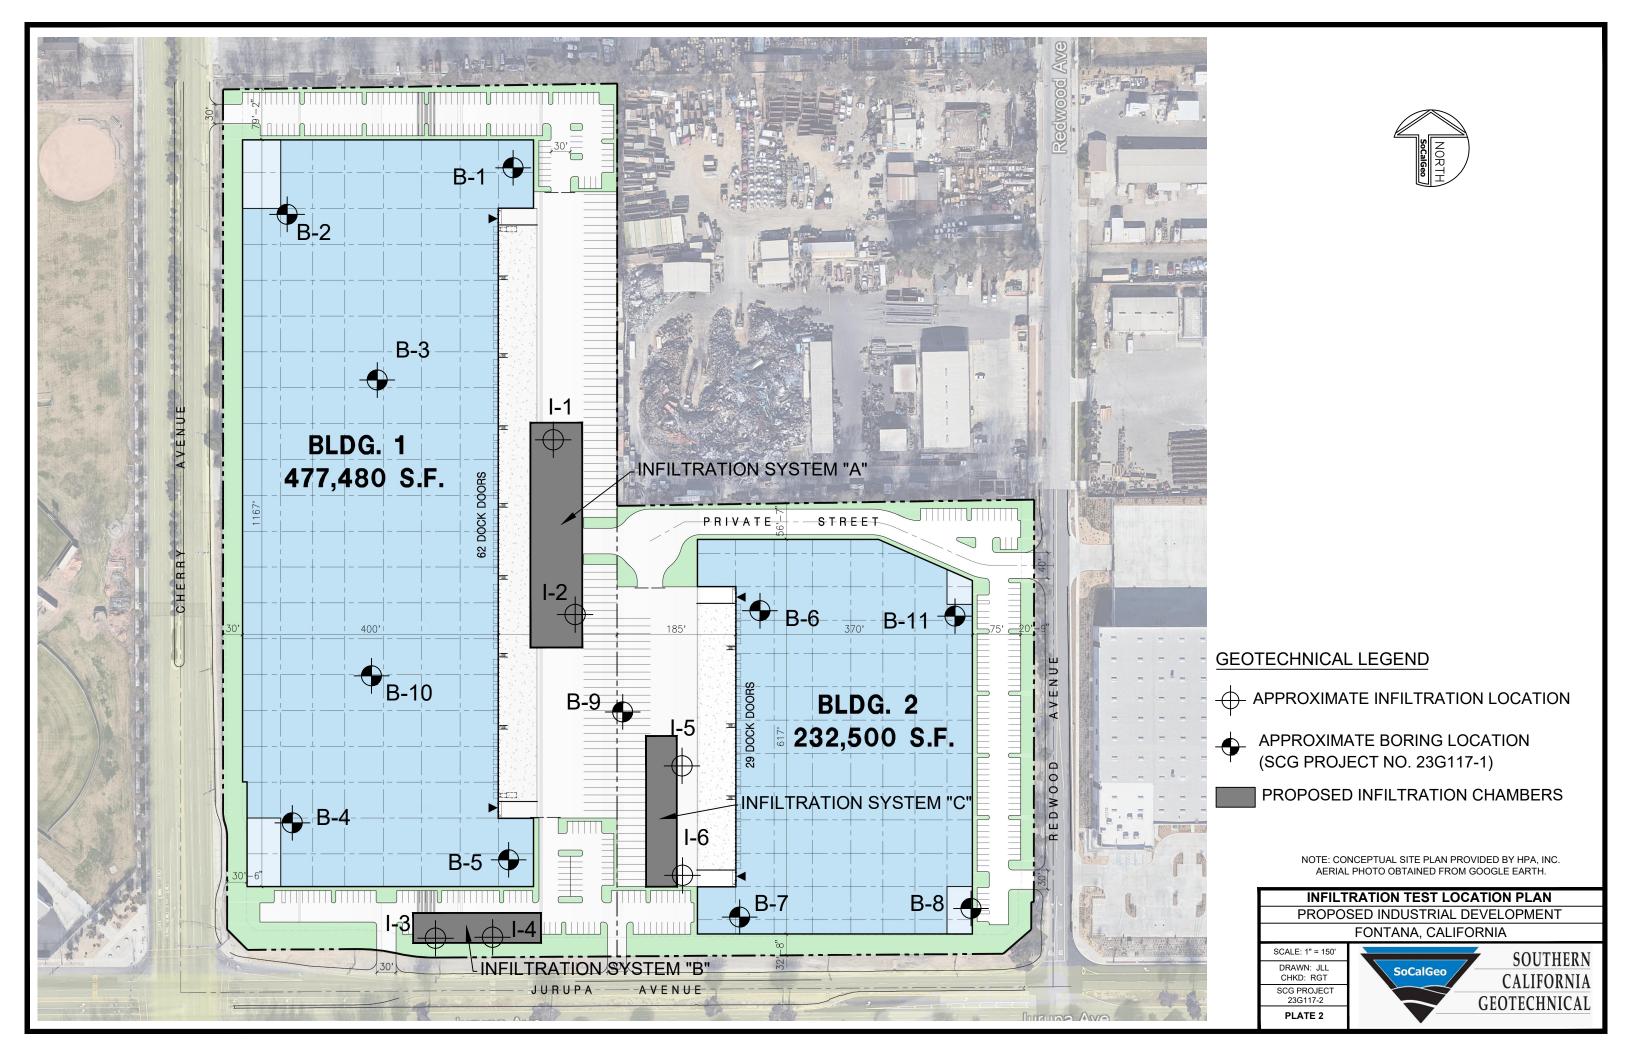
Infiltration Test Location Plan Boring Log Legend and Logs (8 pages)
